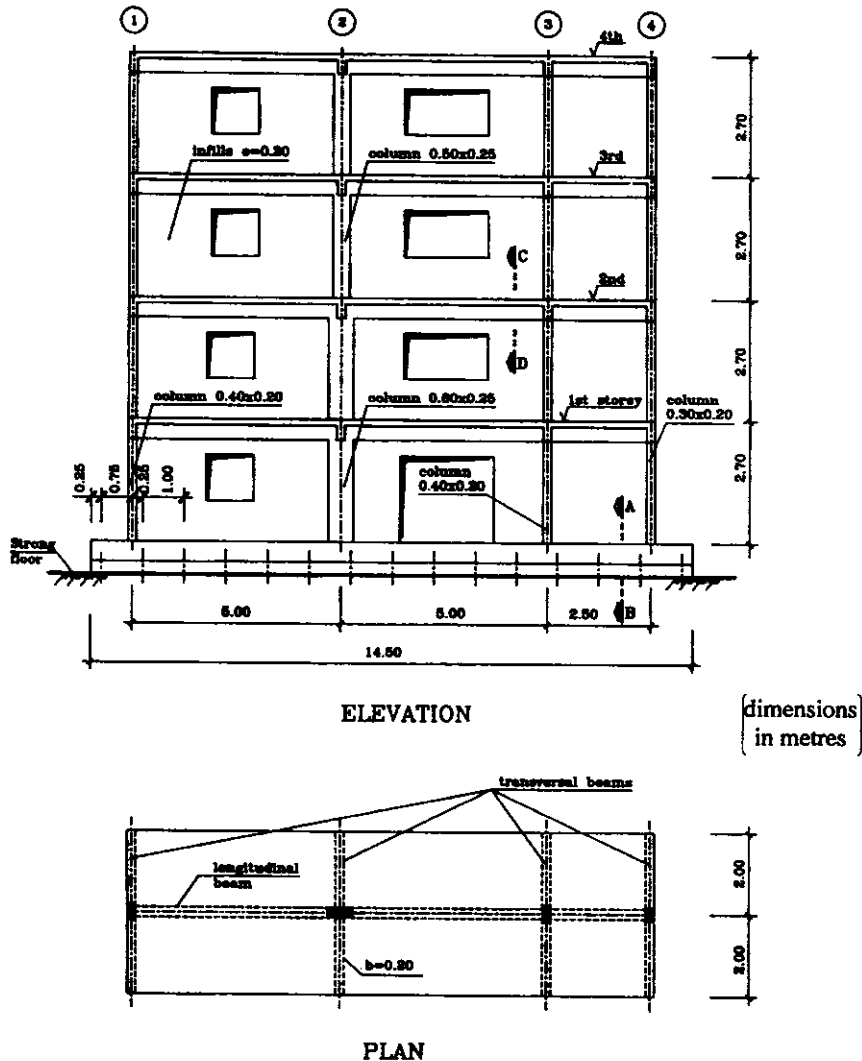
Elevation and plan views of infilled frame (Carvalho et al., 1999)
